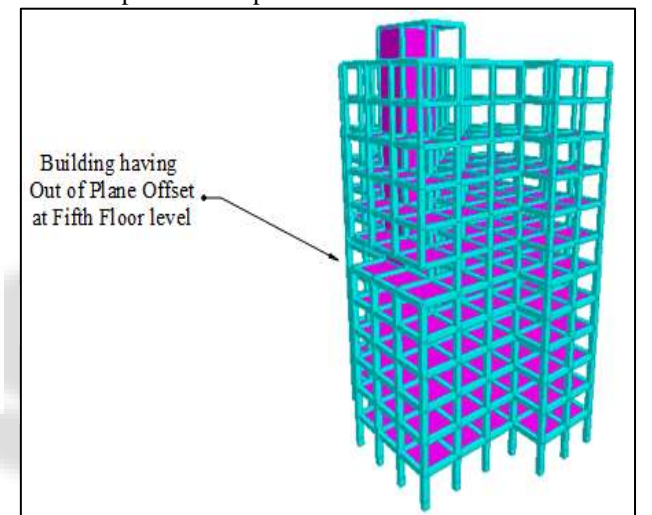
OPO Case 4 - Residential Apartment having out of plane offset provided at 5th floor level
